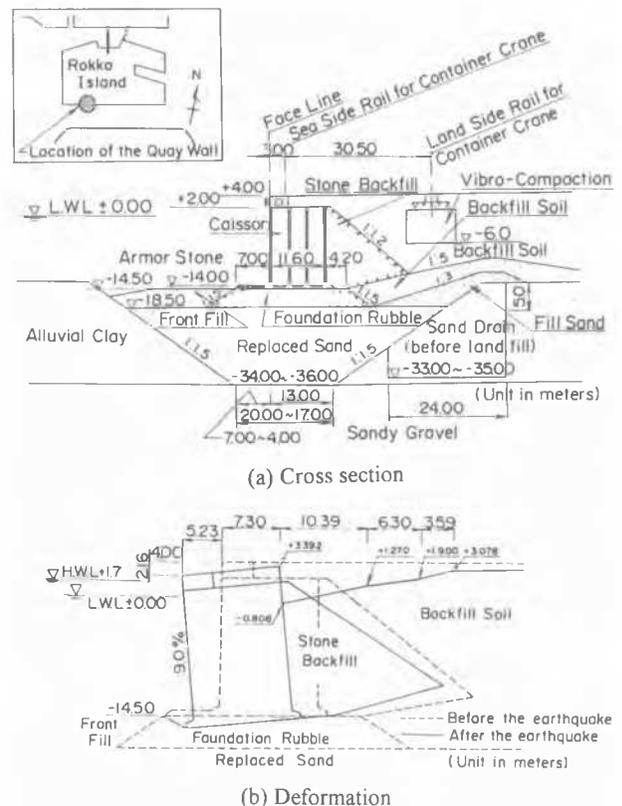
Cross section and deformation of a caisson wall (after Inagaki et al 1996)
